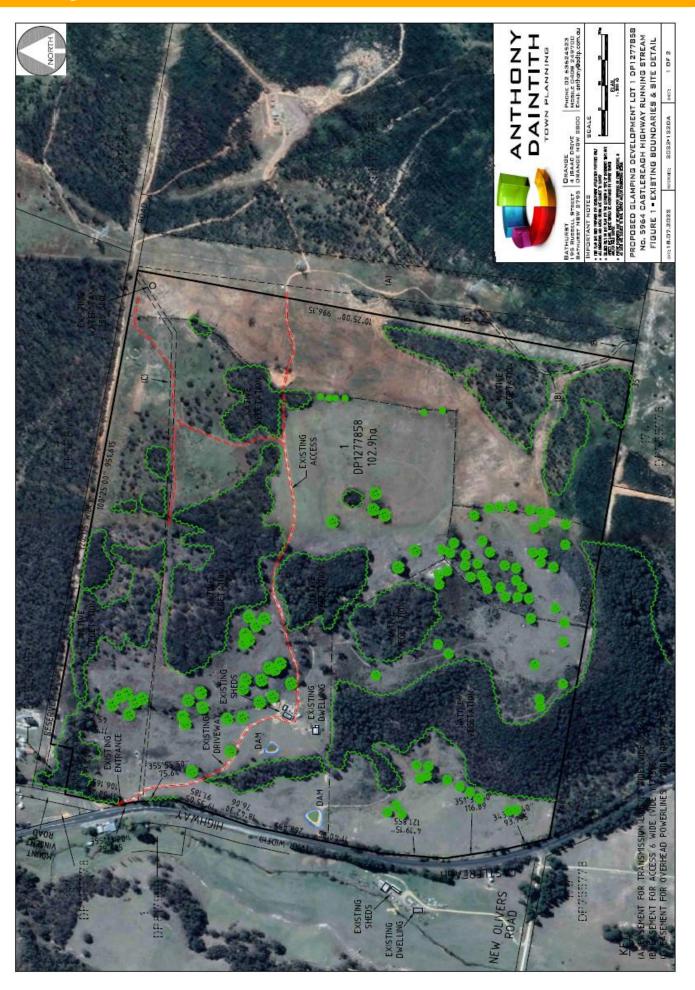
Existing boundaries and site detail by Anthony Daintith Town Planning Ref 2022.122DA Sheet 1
